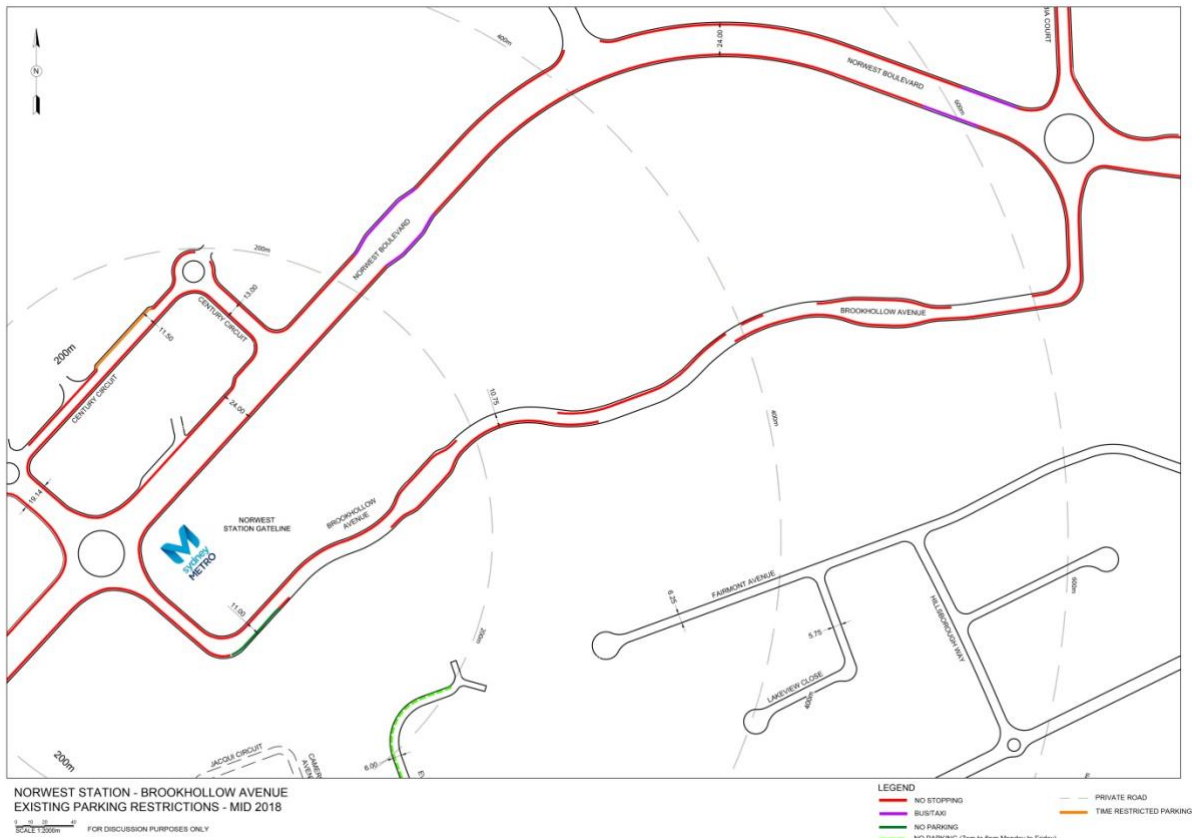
Pre-metro parking conditions mid-2018 – Brookhollow Avenue and Fairmont Avenue
